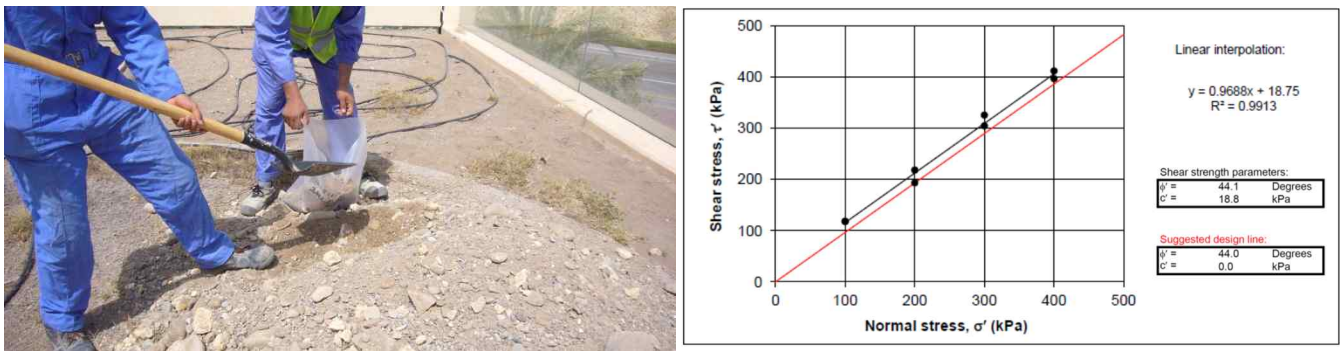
a) Sampling of reinforced fill; b) Shear strength assessment
